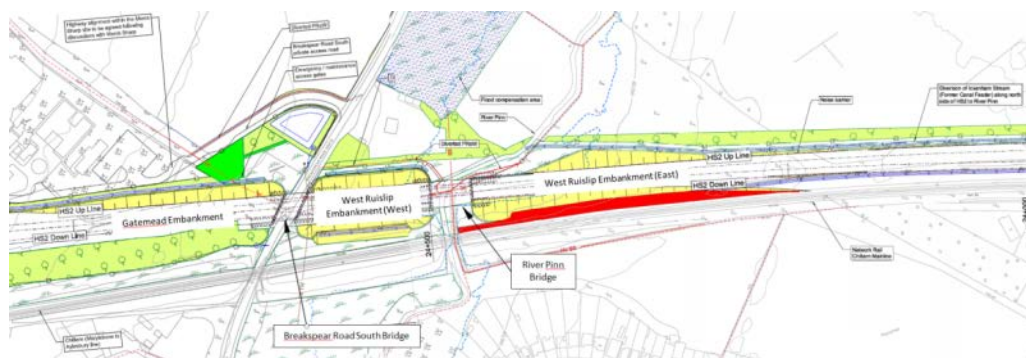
Plan showing Gatemead and West Ruislip Embankments
